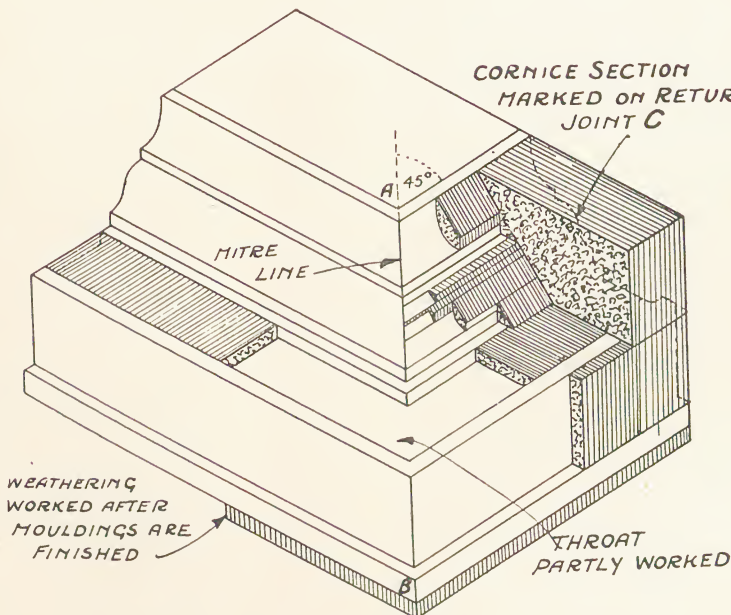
WORKING RETURN PIECE OF CORNICE.
